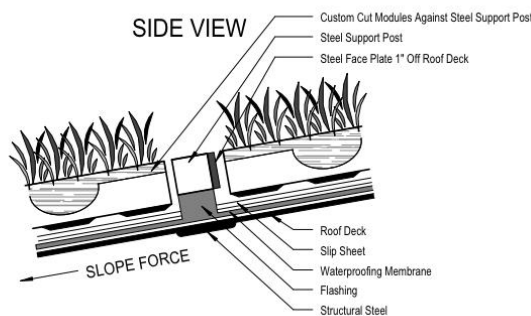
Sloped Green Roof Anchoring Scheme – [Live Roof, 2014]
